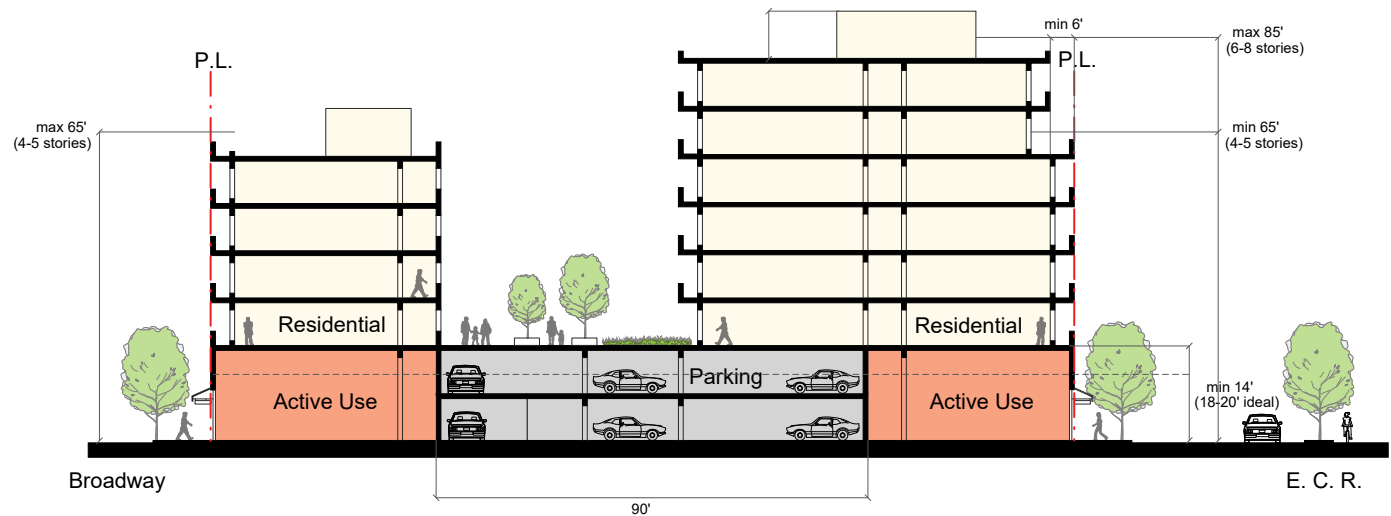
BUILDING HEIGHT TRANSITION ON BLOCKS FRONTING BOTH ECR AND BROADWAY
